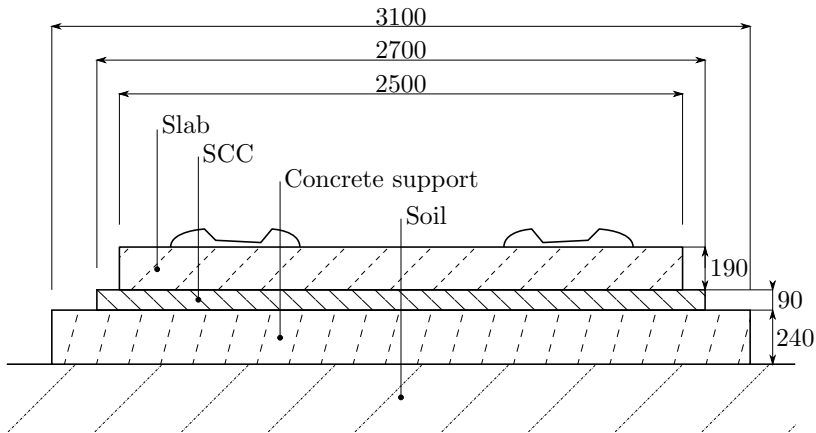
Cross-section and dimensions of the CRTS III track section (in mm).
